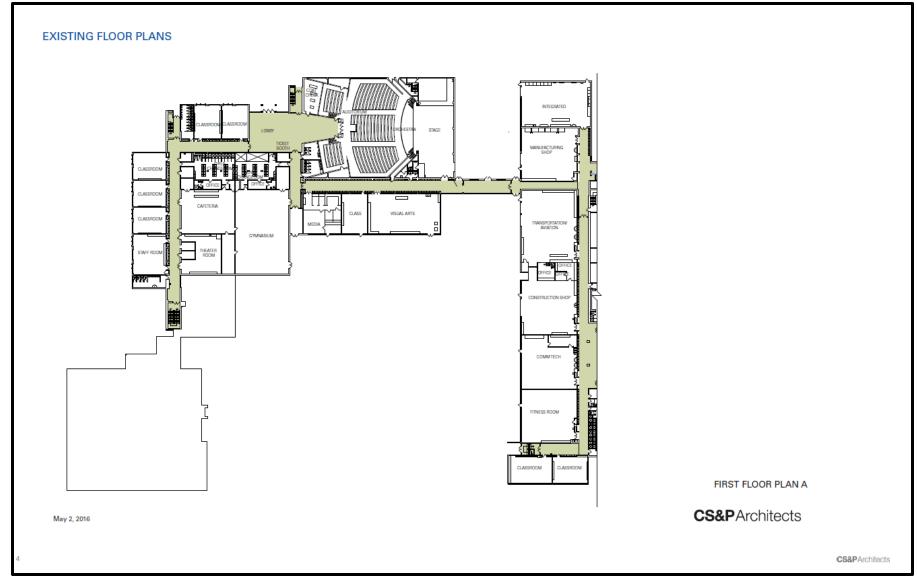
West Wing (Plan A) First Floor (CS&P Architects 2016:4)
